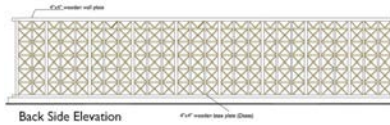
Typical rear elevation of an engineered Dhajji building after the 2005 Pakistan earthquake.
